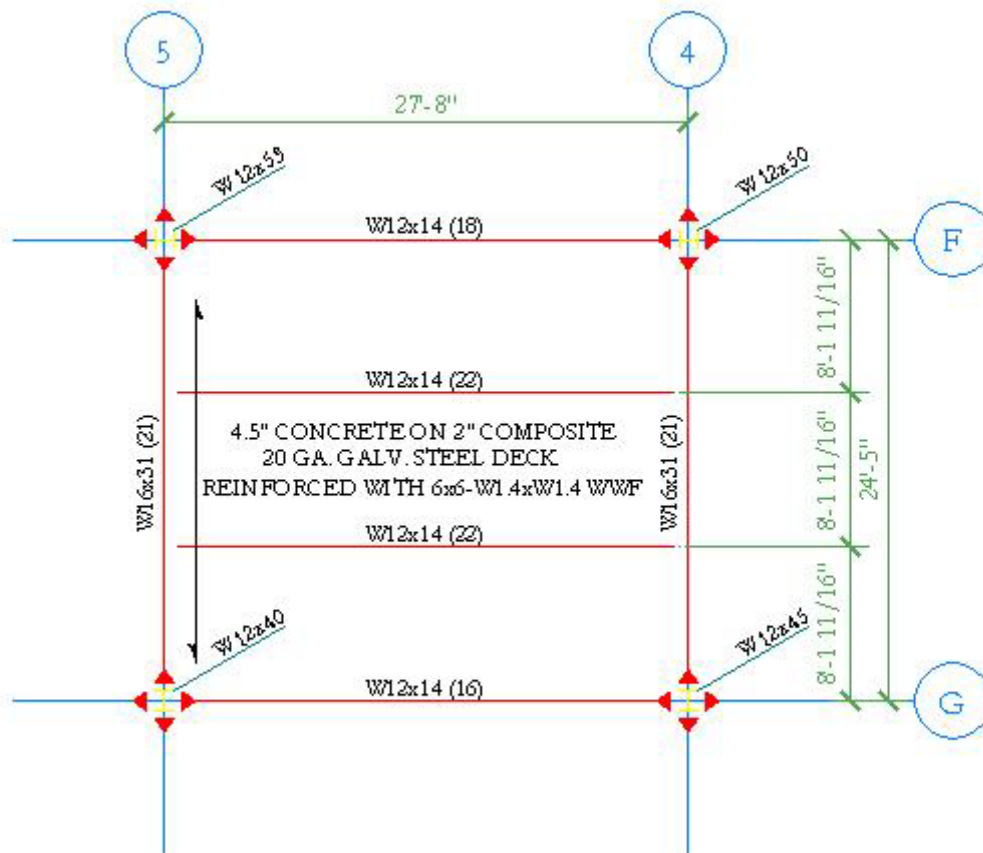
Existing Steel with Composite Steel Deck Typical Floor Framing Bay
